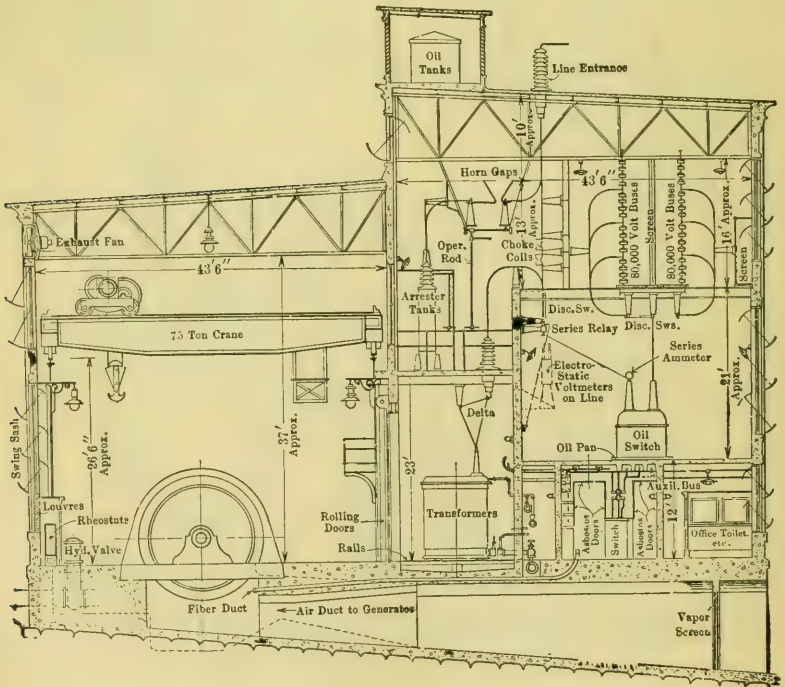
Typical Hydro-Electric Power-house Arrangement. Cross-section. (For floor plan see Fig. 99A.)
